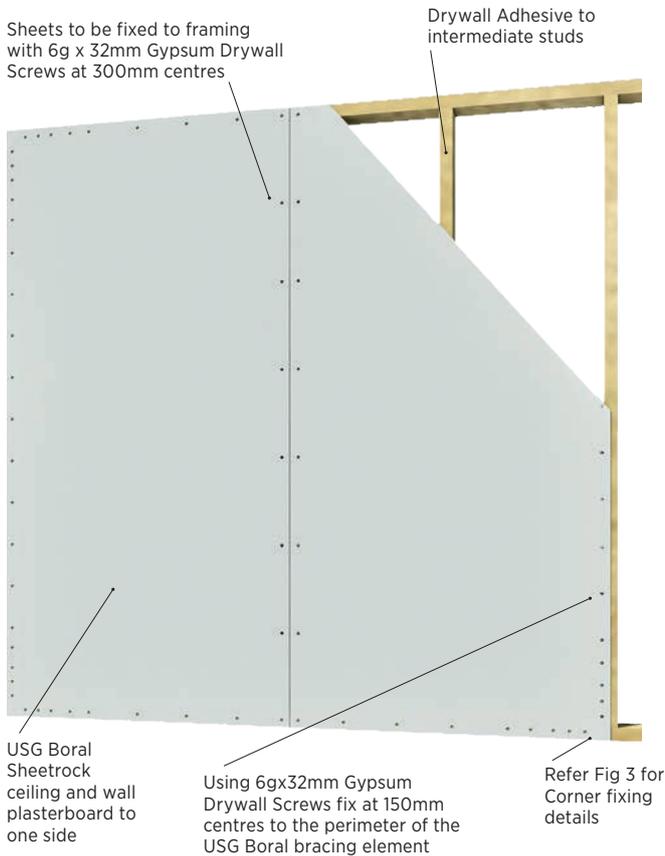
UB1S BRACING SYSTEM WITH SHEETS INSTALLED HORIZONTALLY
